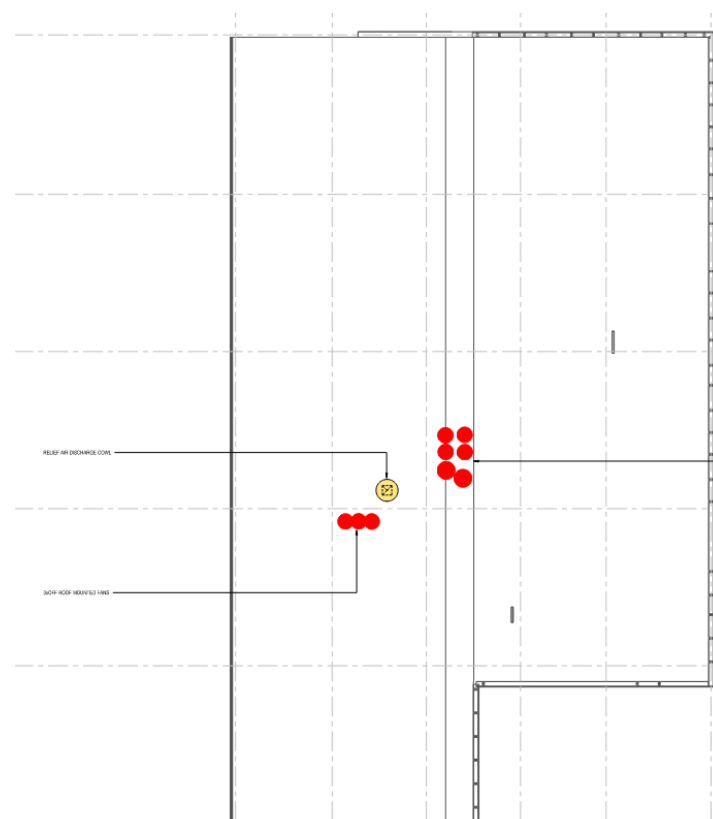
Proposed mechanical plant equipment location – Rooftop North-East Bldg.
